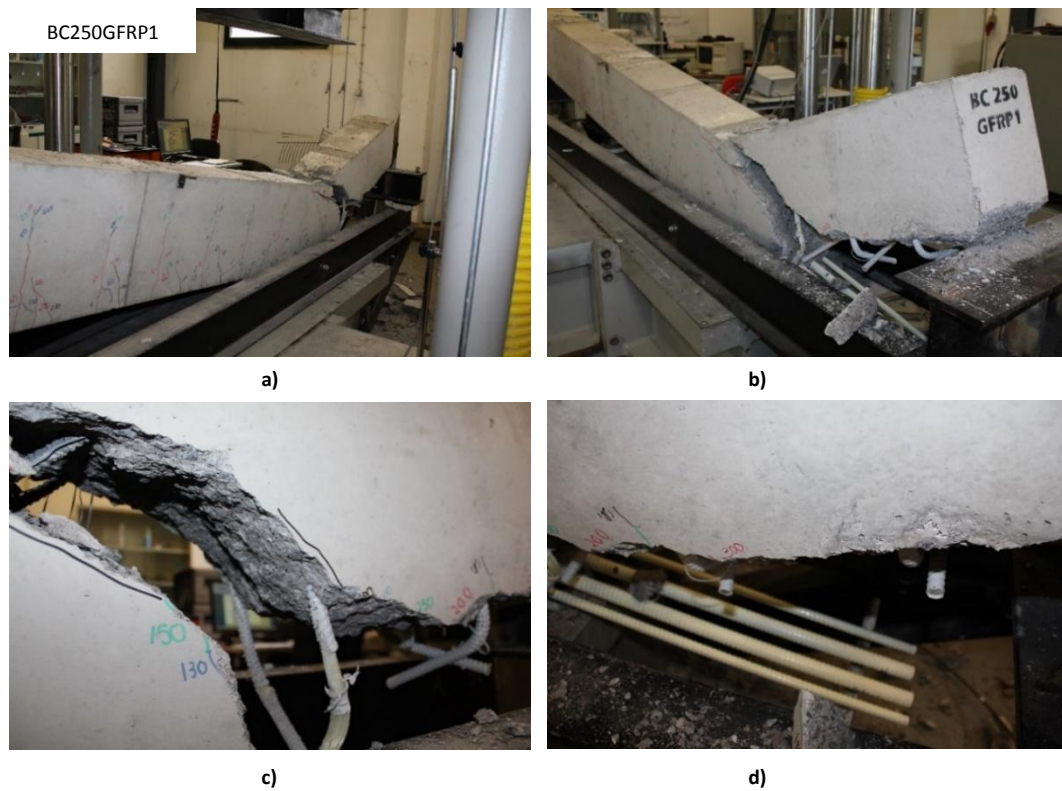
BC250GFRP1 beam failure: a) overall view; b) near the support; c) stirrup disintegration; d) pull-out of bottom reinforcement
